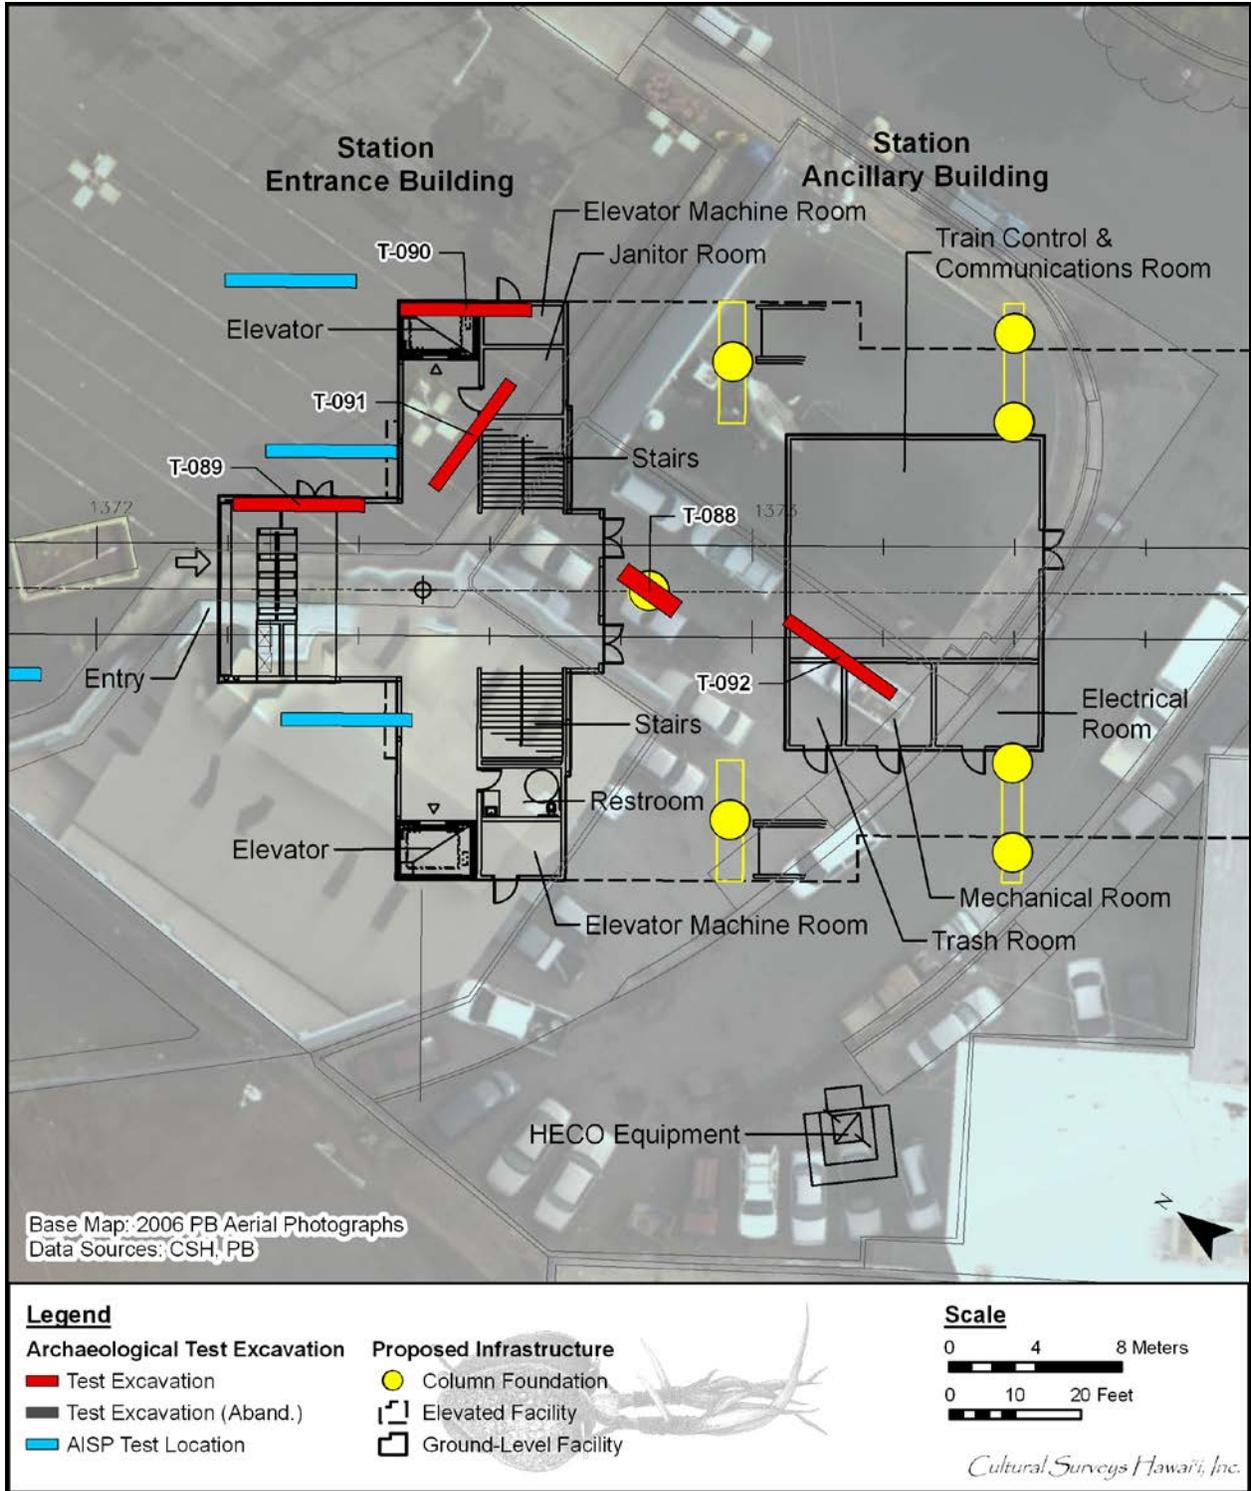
Iwilei Station, detail of Station Entrance Building showing locations of proposed AISP and actual AIS test excavations
